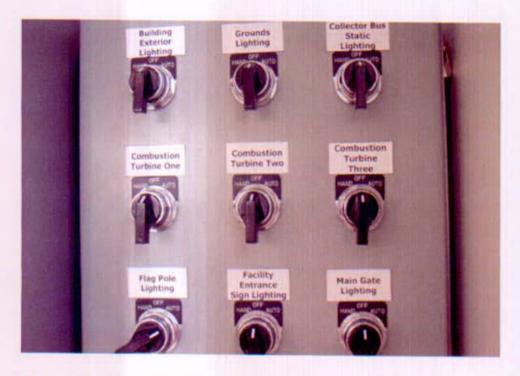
View of the manual light control panel at the Facility.
